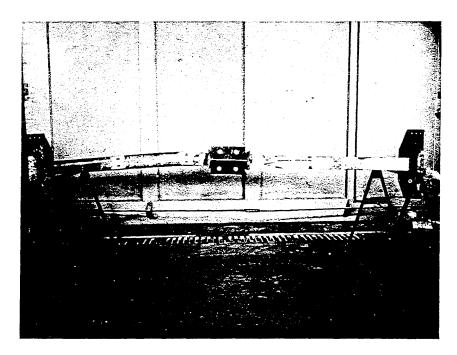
b. Plan View of Specimen 42 S 6 I 12.5
